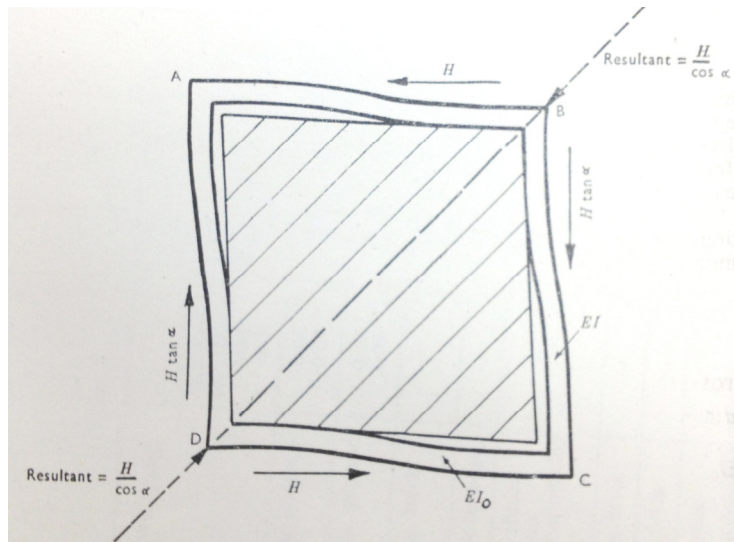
Contact of wall and frame of infilled framed at failure.
